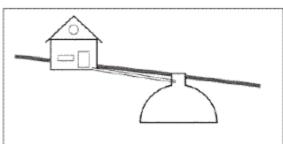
Piping system with straight slope from kitchen to digester. No water trap required as condensation water drains into the digester Source: TBW
